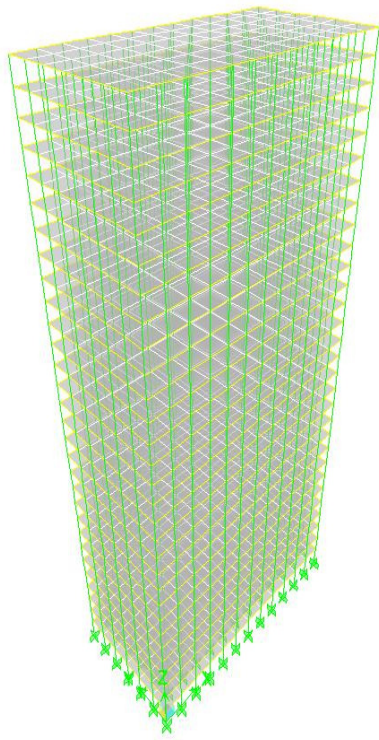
c): High-Rise Building with Rectangular Plan Geometry
